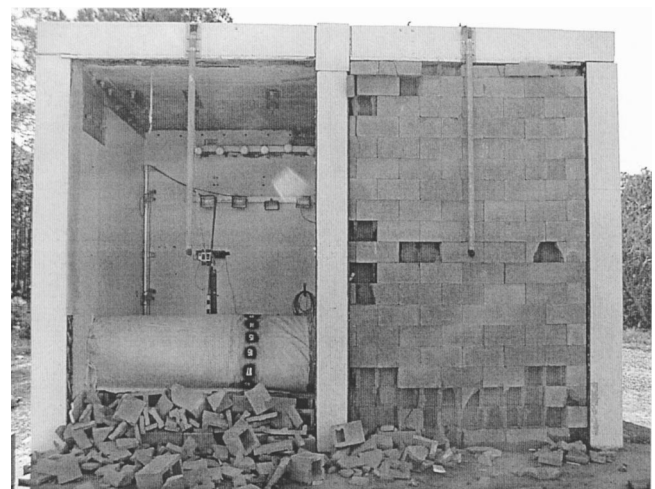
Posttest configuration for Walls 11 (right) and 12 (left)
